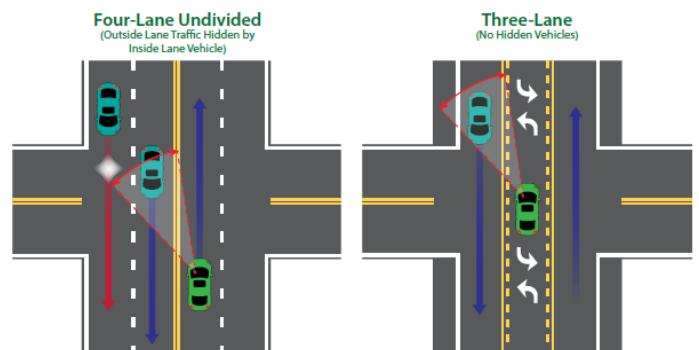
Major-Street Left-Turn Sight Distance for Four-Lane Undivided Roadway and Three-Lane Cross Section
